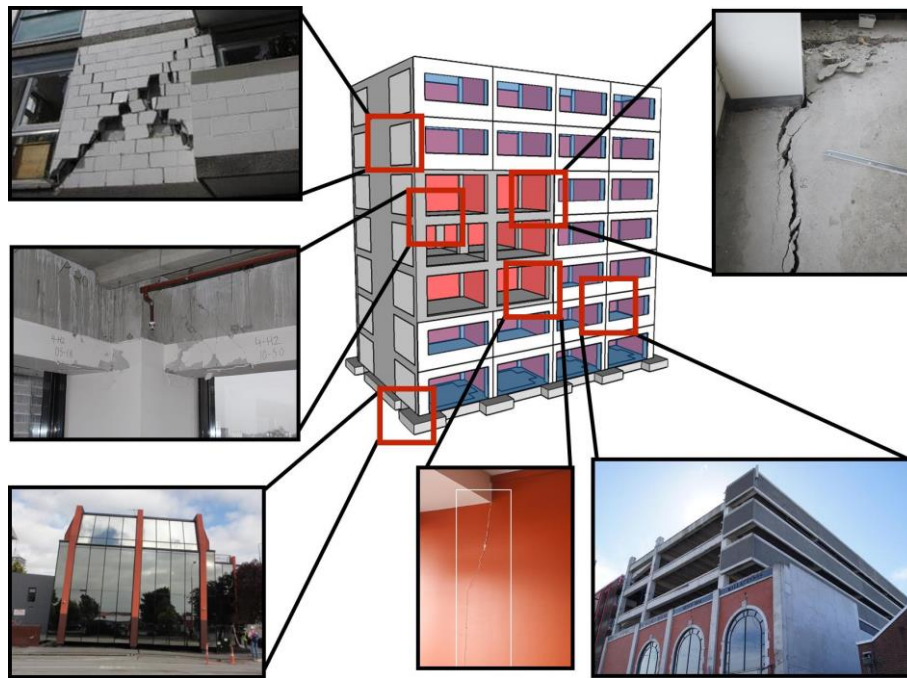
Holistic representation of damage/performance to a modern building, including structural skeleton (frame system, floor diaphragm), non-structural components (lightweight partitions, heavy brick infills and precast concrete facades) and foundation system (significant settlement and residual tilting) (modified after Johnston et al., 2014)
